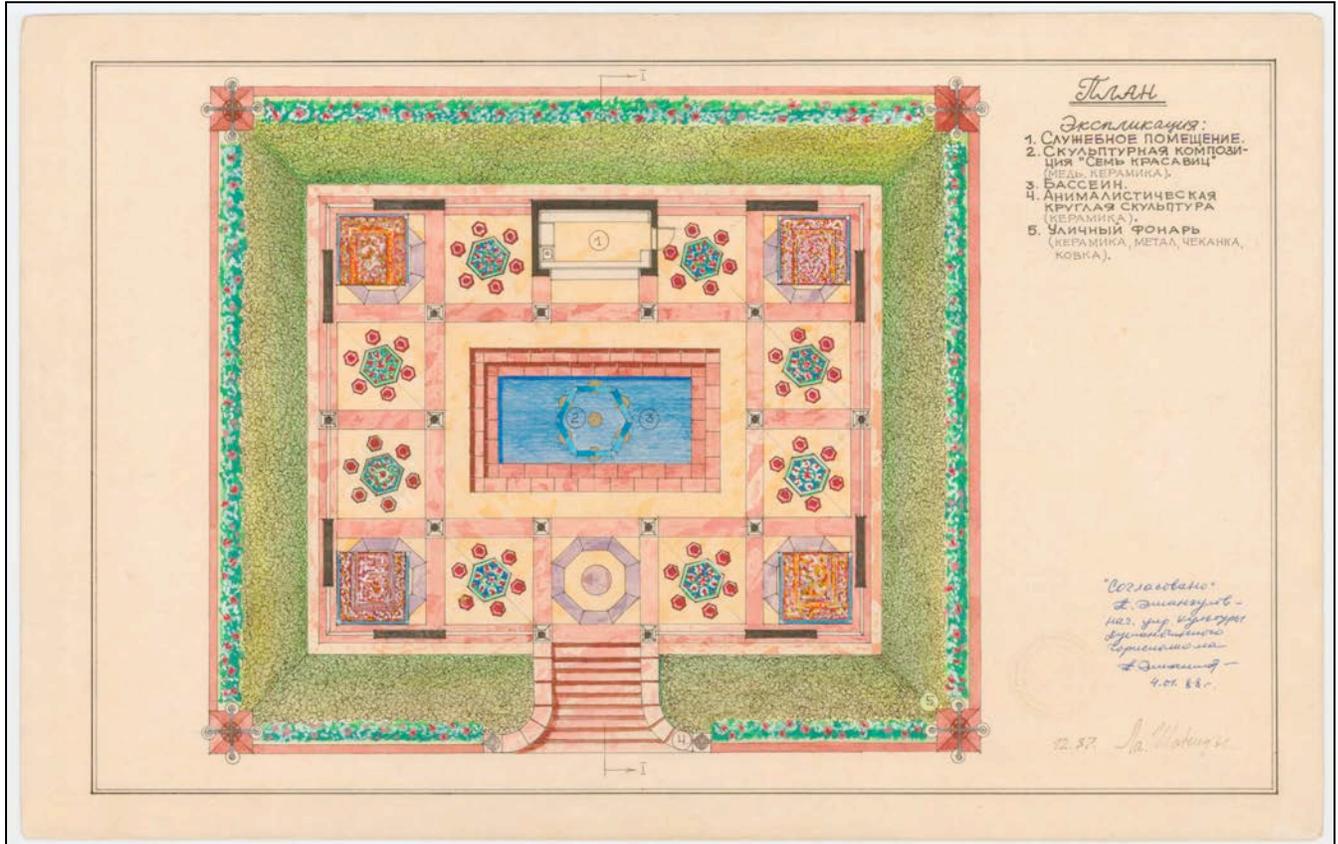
Boulder-Dushanbe Teahouse: Original Floor Plan, Lado Shanidze, 1988
